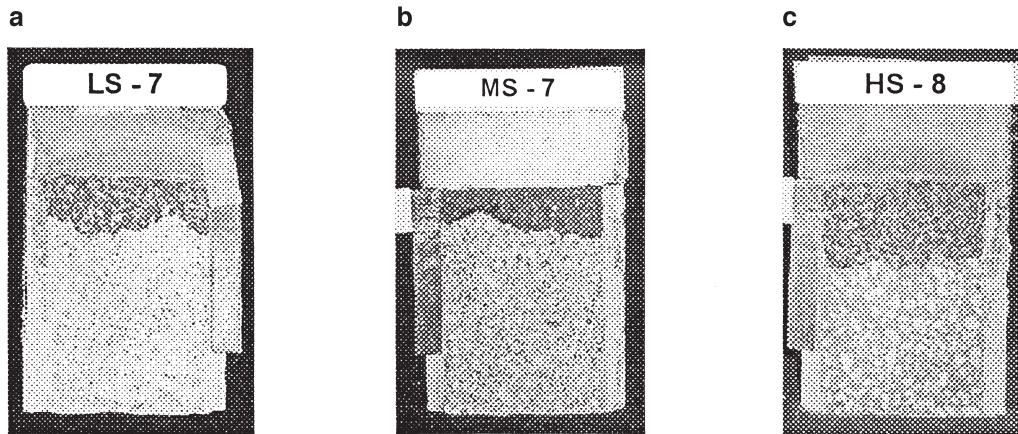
The crack fronts of dyed specimens. (a) concrete LS, (b) concrete MS, (c) concrete HS.
